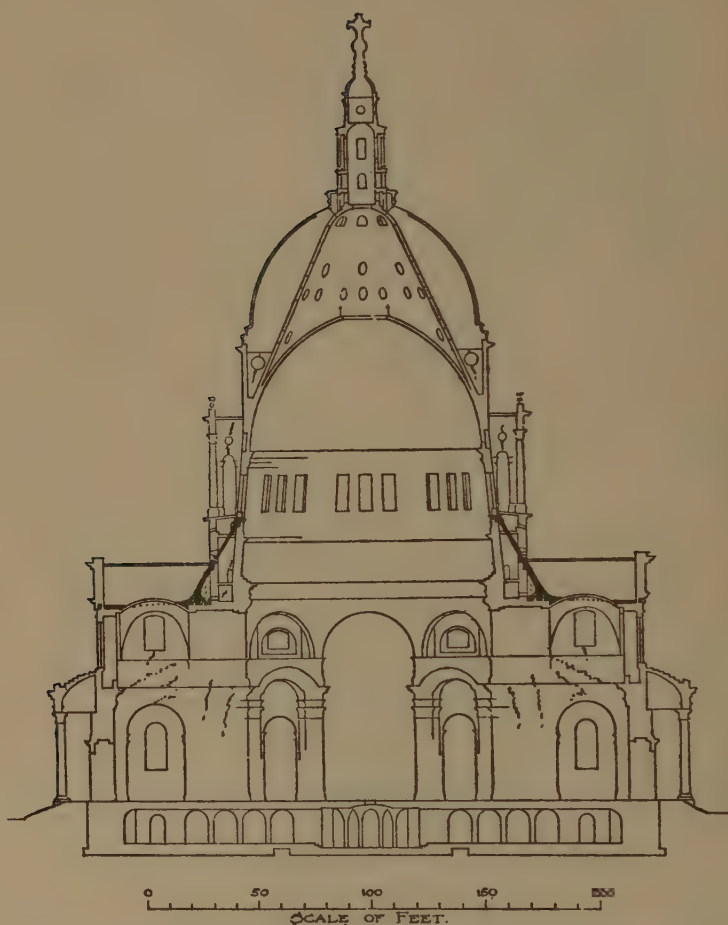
St. Paul's Cathedral. A.—Cross-section showing positions of principal defects and suggested cone to diffuse the weight of the drum over the tops of piers now being crushed by eccentric loading on one inner corner of each. The cone, or some such device, would be required to hold the upper portion of the building steady during the execution of principal repairs below—the re-coring of the piers with reinforced concrete.
